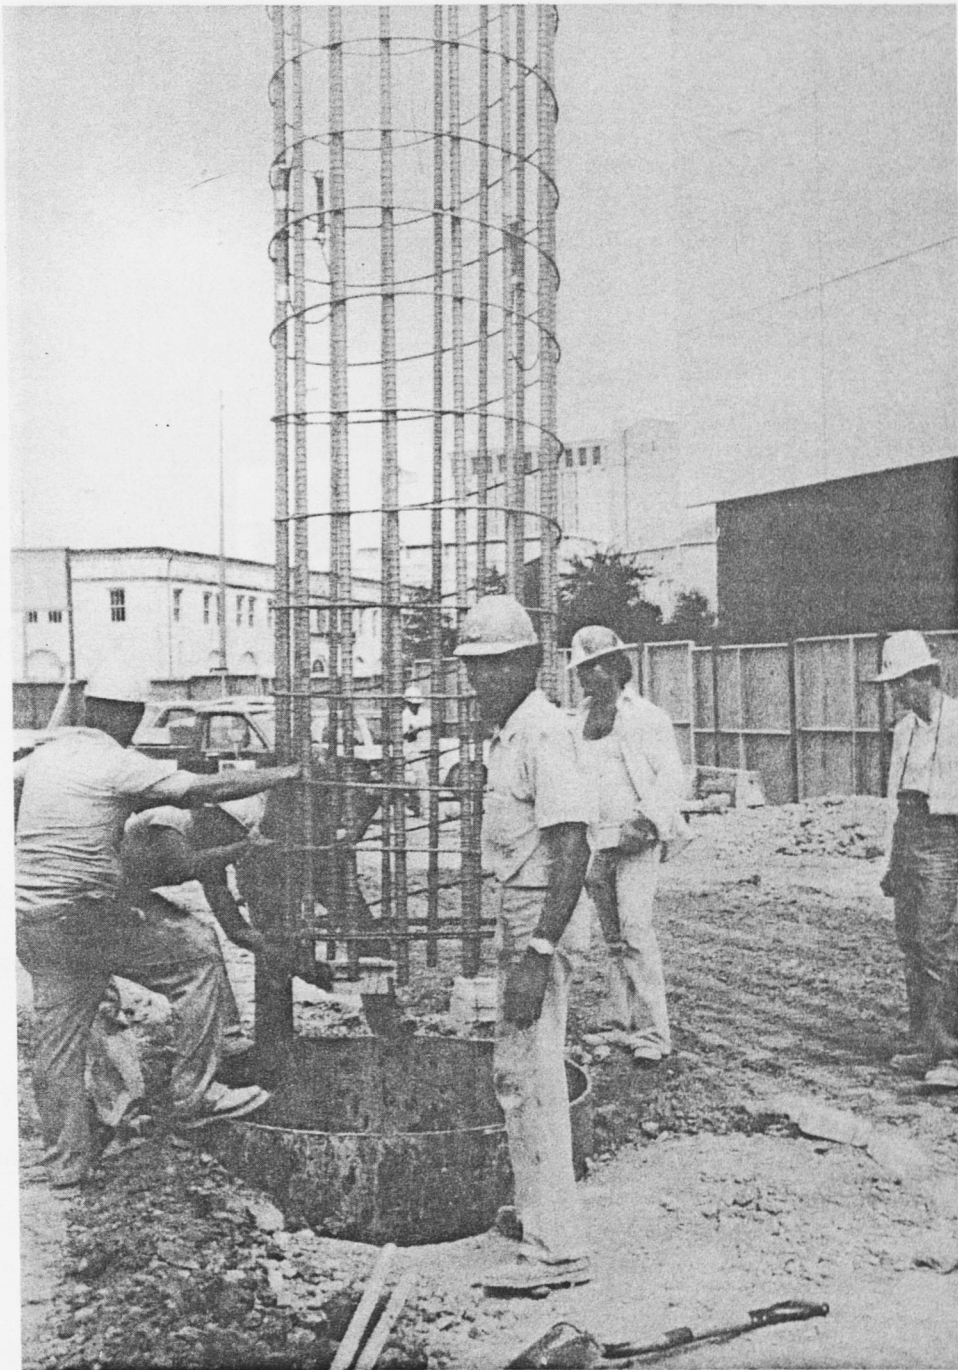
INSTRUMENTED CAGE BEING PLACED IN PIER SHAFT
